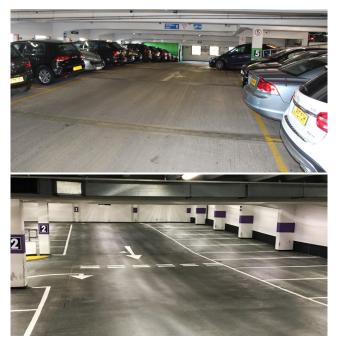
,500m<sup>2</sup> of deck waterproofing # Reinstate line marking and directional instructions
